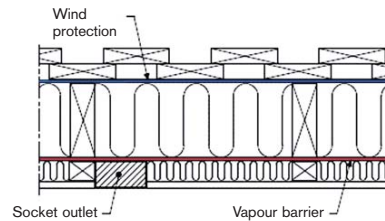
Horizontal section through a socket outlet in an external timber frame wall. The plastic sheeting in the wall is positioned within the structure of the wall, which makes it possible to locate wiring and socket outlets on the room side of the plastic sheeting. This means that the sheeting can be placed continuously and the airtightness requirements can be met. [Elmroth and Levin, 1983]
